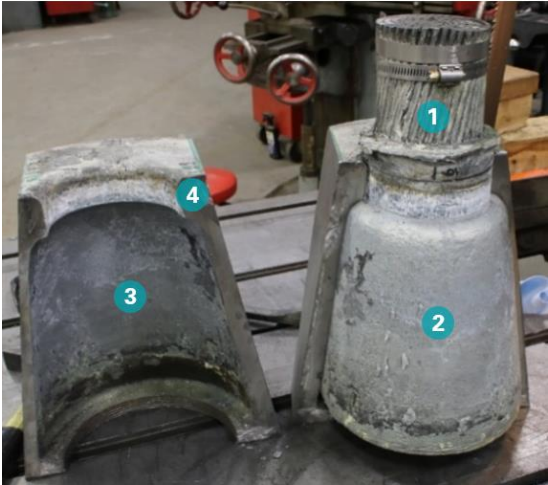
Zinc casting of auxiliary backstay socket B4N_G (photo: Socotec).
